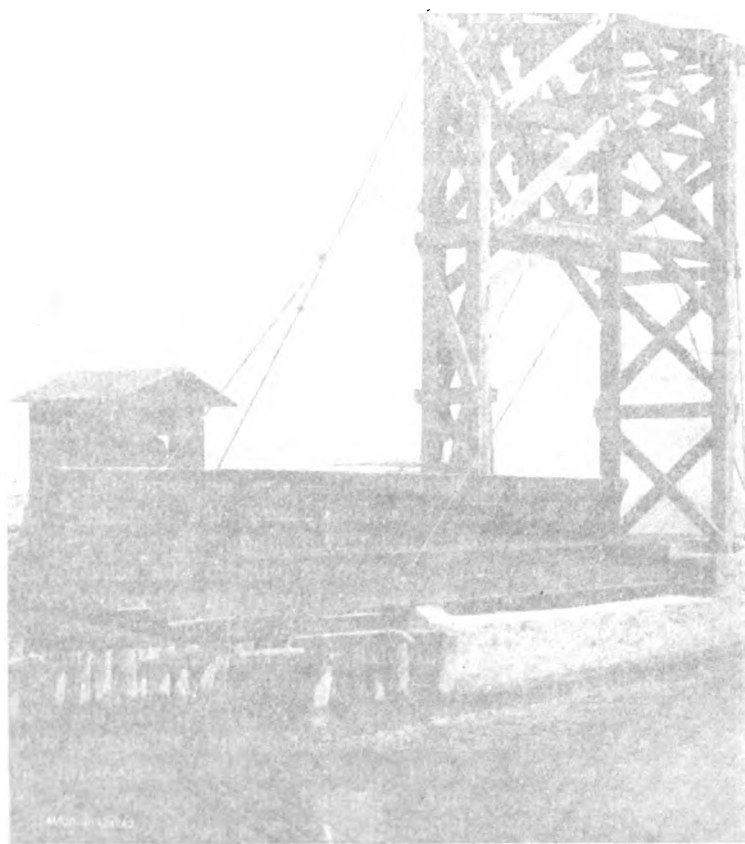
A view of the wooden truss structure of the bridge, showing the tower and the cables.
